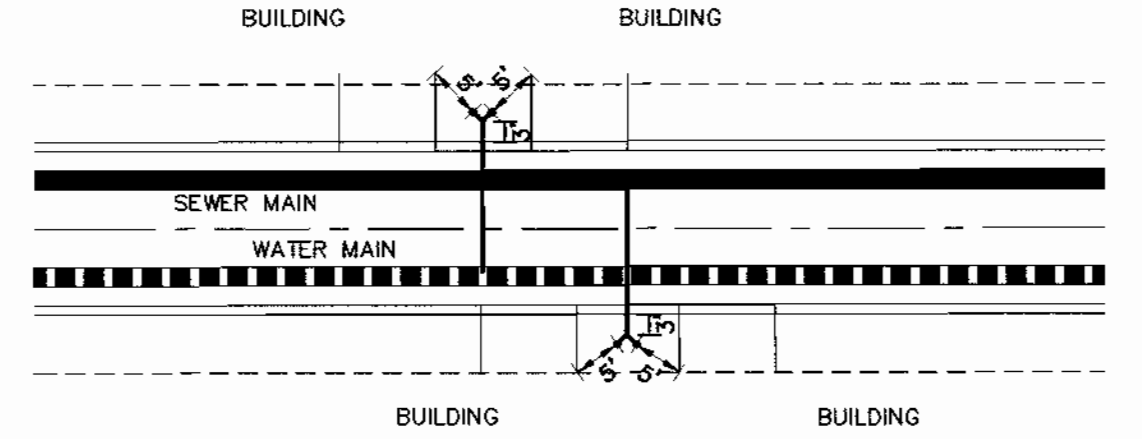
DETAIL FOR CONVERSION OF TWIN SEWER HOUSE CONNECTION TO SINGLE SEWER HOUSE CONNECTION
